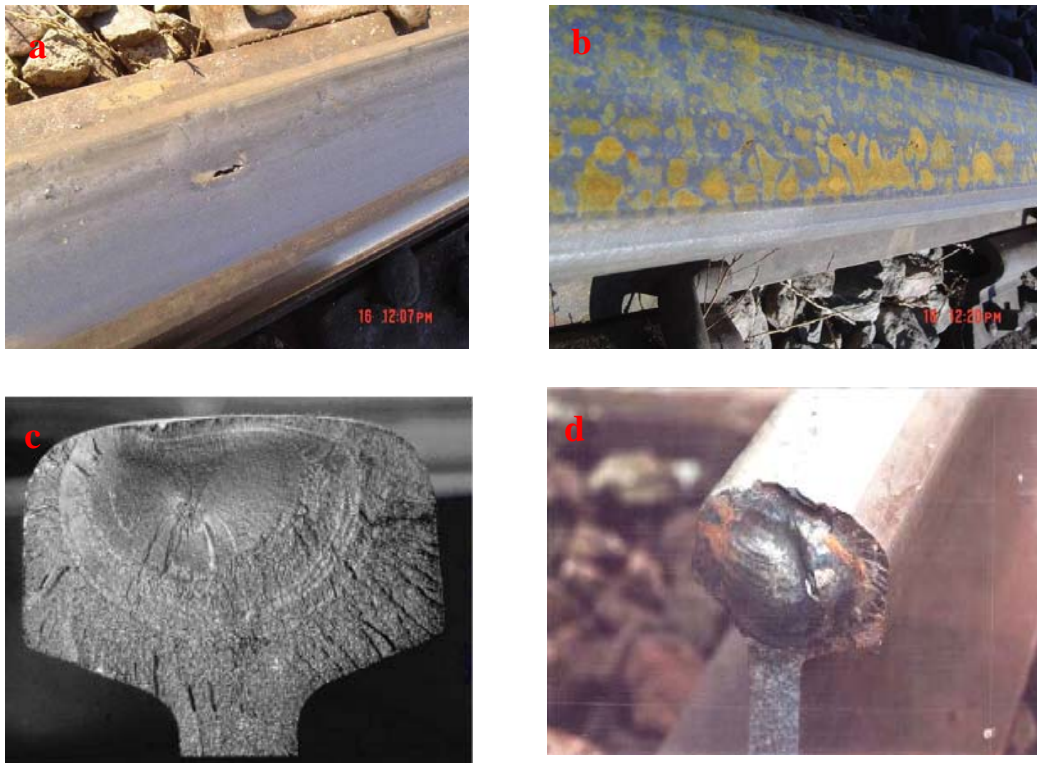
a) Surface crack b) corrosion c) fatigue tache ovale [90] d) fatigue failure [90]
